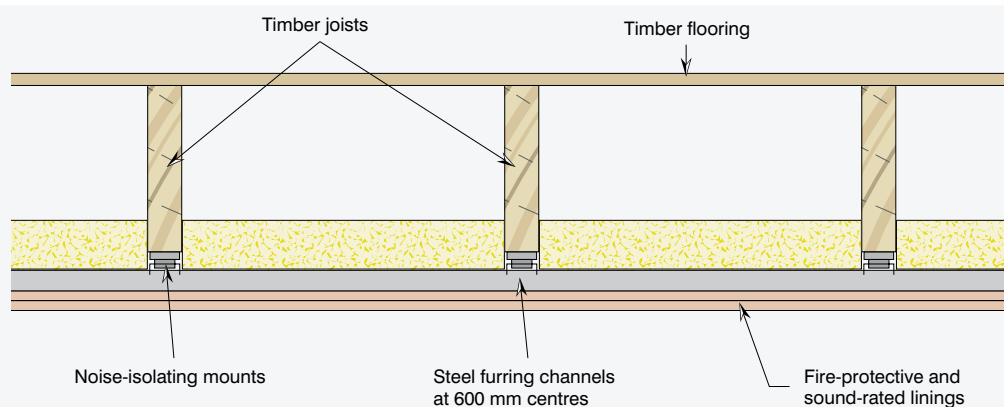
Fire- and sound-rated timber-framed floor – elevation view.
